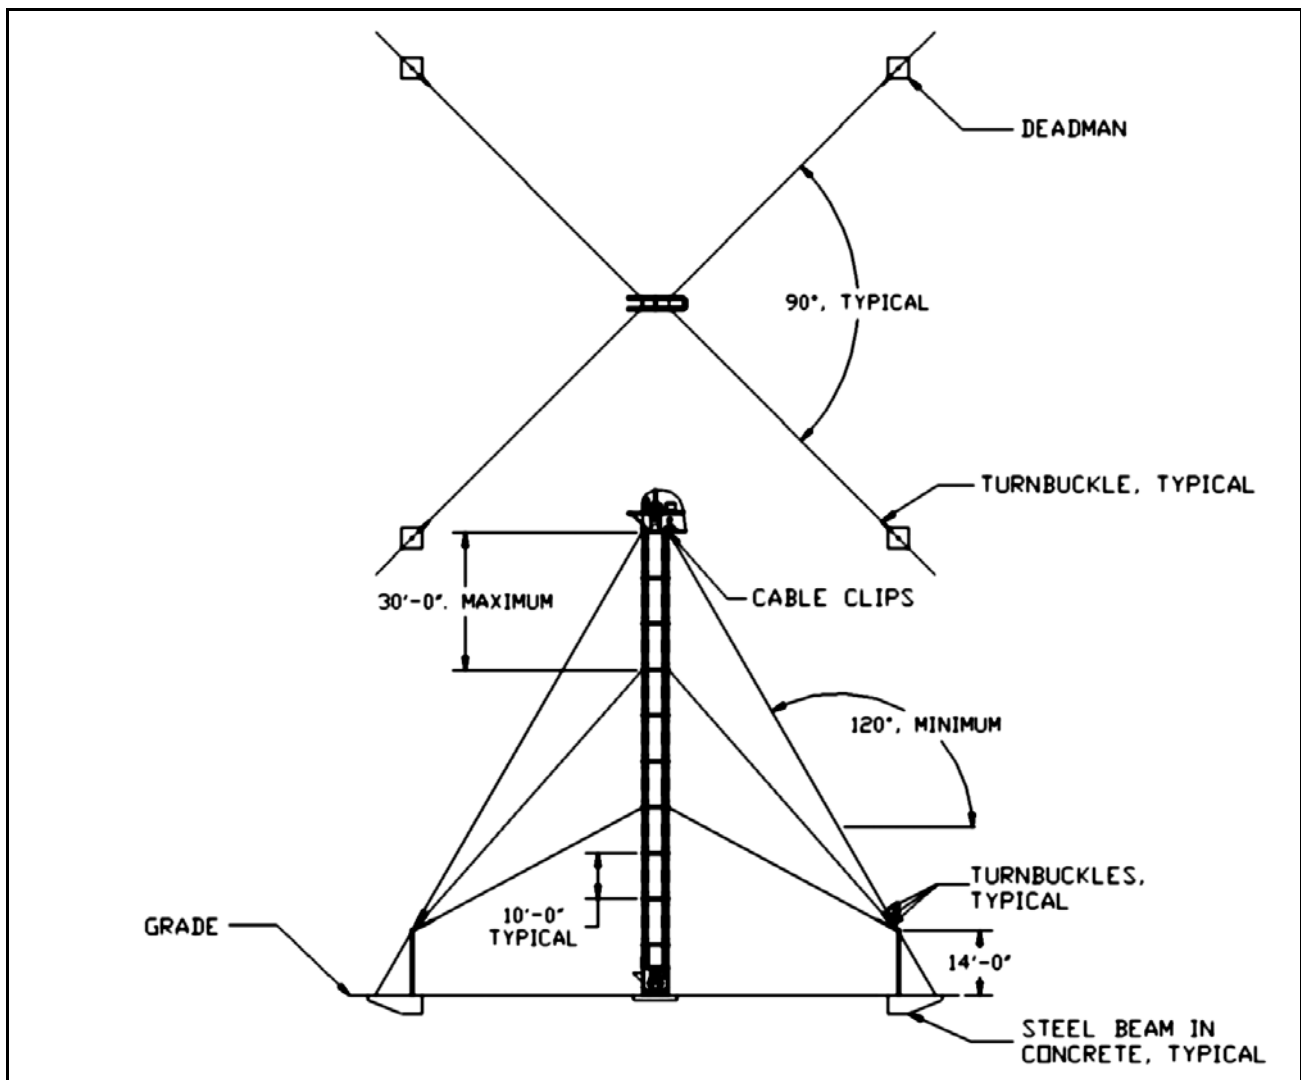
Typical Anchor & Guy Cable Arrangement and Location
